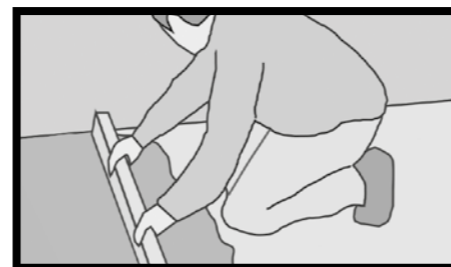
ZERO.3 - 3 Plus and ZERO.3 - 5 Plus can be installed directly on the CeraVent® Gutjahr® system. This system allows for wall installation (walls featuring salt and rising damp, damaged facades, mixed supports, prefabricated materials, etc.) and offers microventilation and uncoupling from the substrate.
